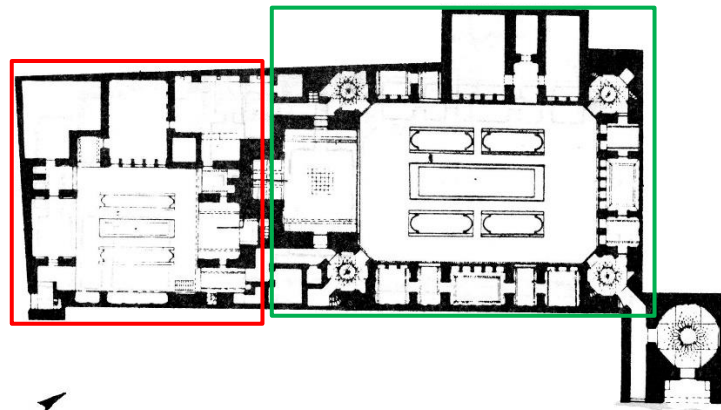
Ground floor plan of Mortaz house. Inner (right) and outer (left) zones. Courtesy of documents' center of college of art and architecture, Yazd University.
